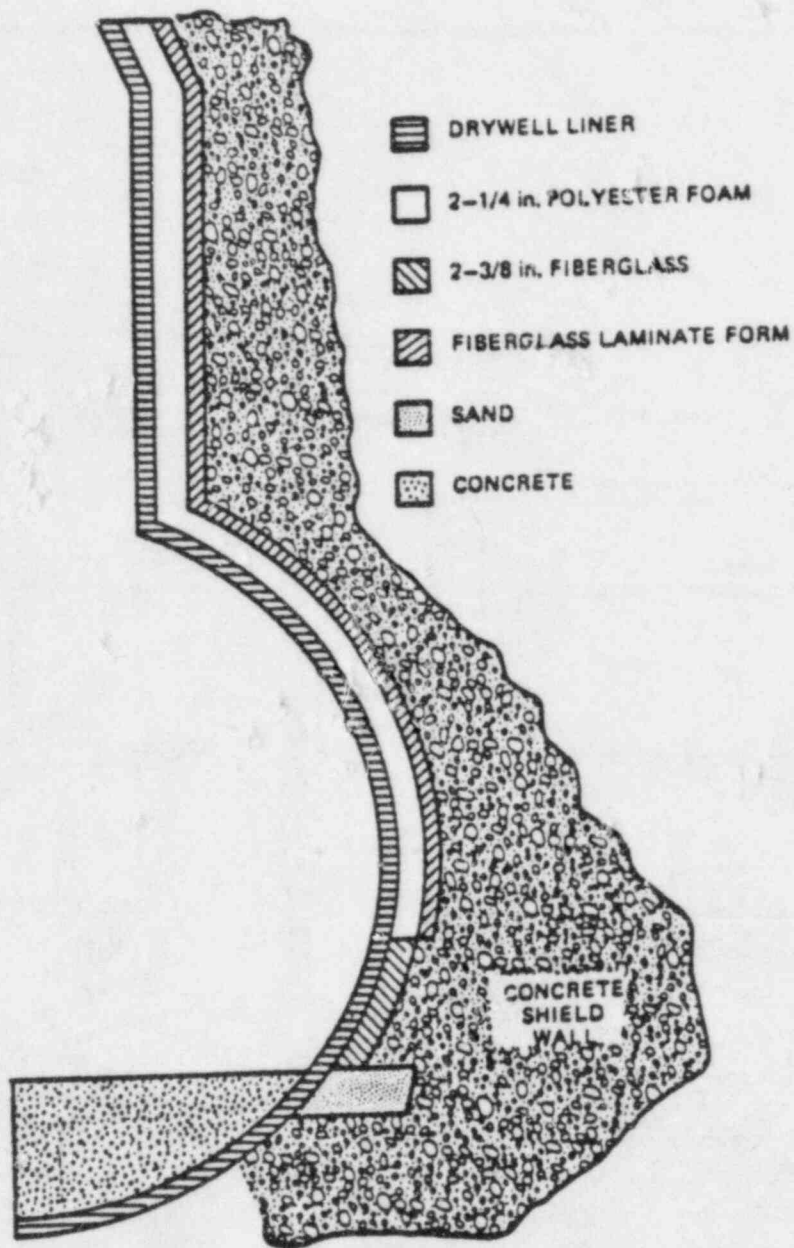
Drywell Liner - Concrete Shield Wall Gap Geometry
